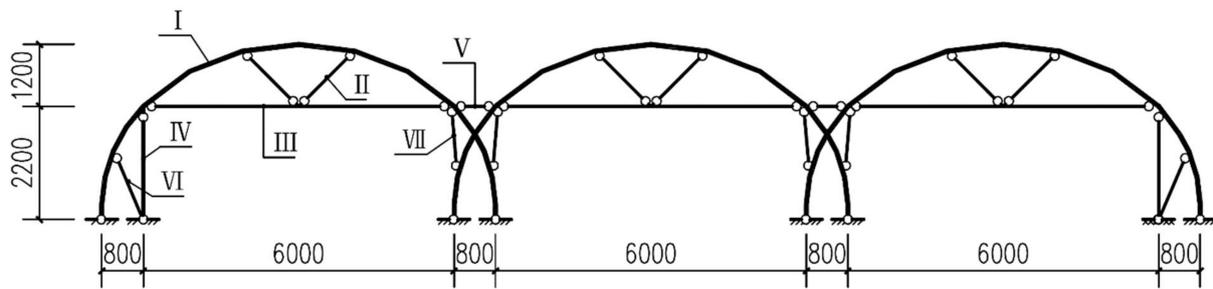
Systematic diagram of the multi-arch greenhouse structure (unit: mm). Notes: I—arch bar, II—web member, III—tie beam, IV—side wind-resisting column, V—in-greenhouse beam, VI—side reinforcement bar (adopted at a high wing load), VII—reinforcement bar; the icon of “o” is the hinged point or hinged support.
